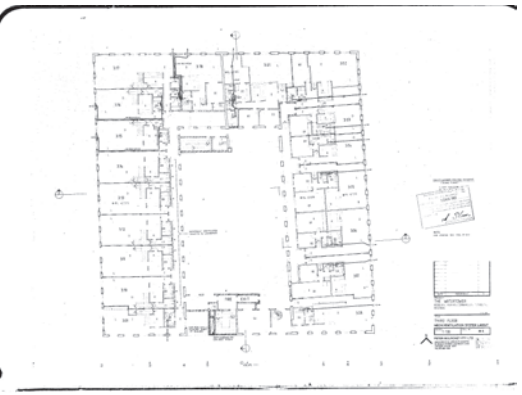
Third Floor Plan, Peter Mulrone Pty Ltd.
